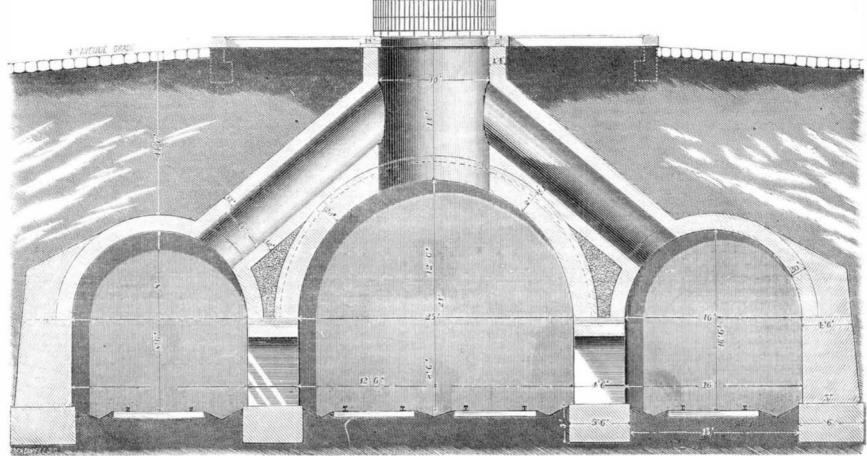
THE UNDERGROUND RAILWAY IN NEW YORK.-CROSS SECTIONS OF THE MASONRY TUNNELS AND VENTILATING SHAFTS.
